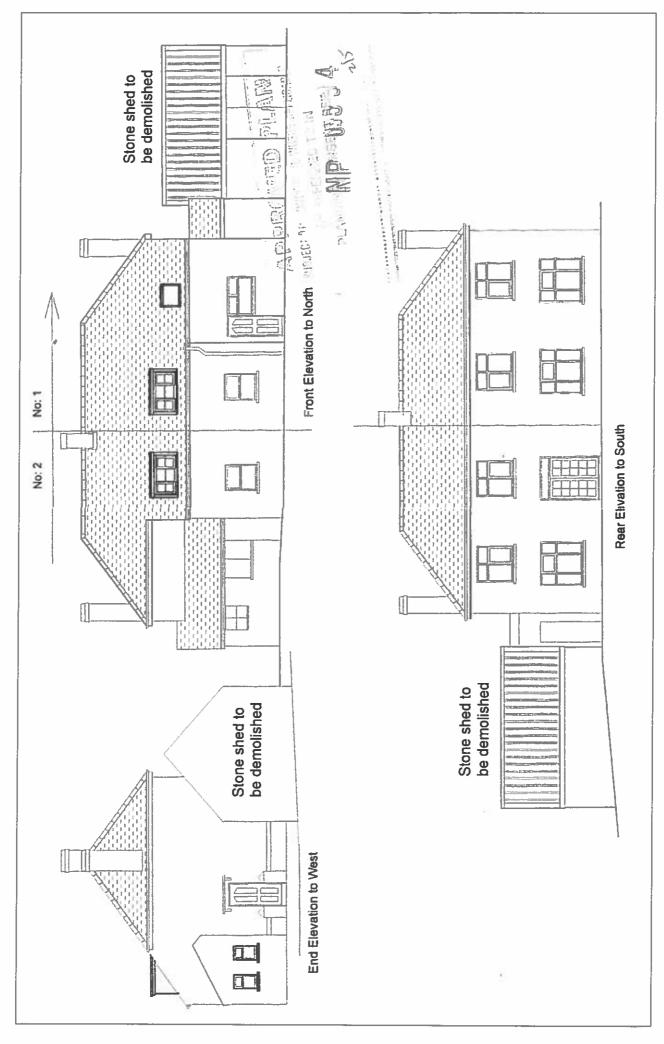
Existing elevations of No 1 Robeston Hall, Robestion West, Milford Haven.
